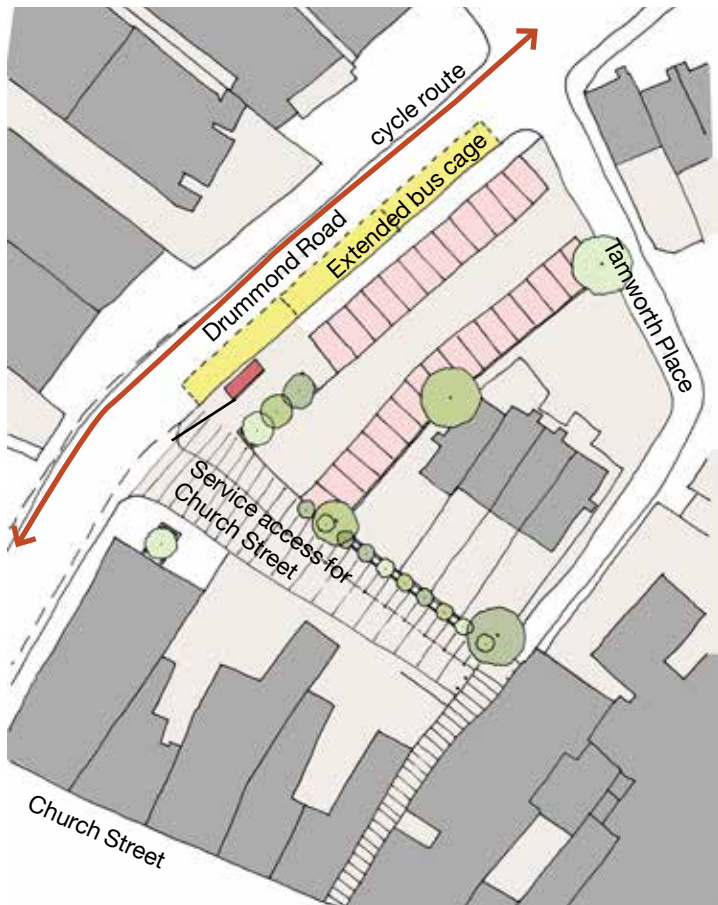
Plan of Ann's Place Car Park (East) consolidated car park and improved route to Church Street
